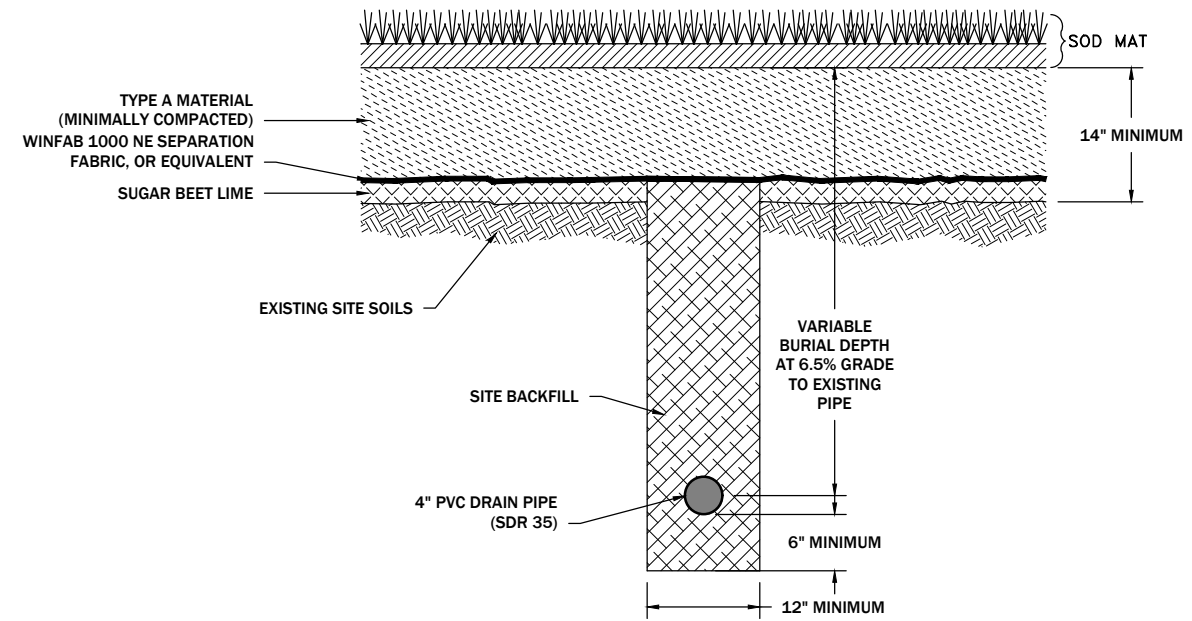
DRAIN ELEVATION PROFILE VIEW
